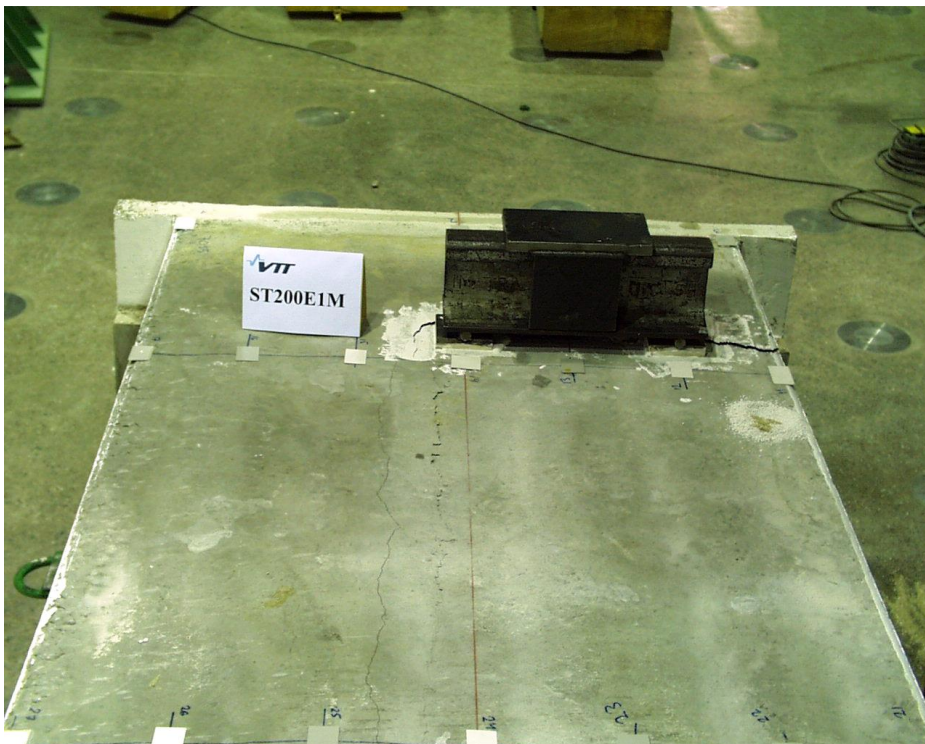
ST200E1M. Top surface after removal of measuring devices.
